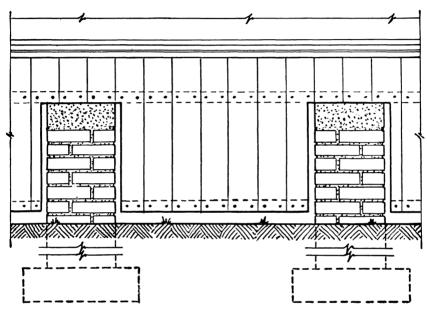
Wooden skirting between piers with a minimum side clearance of 1 inch and ground clearance of 2 inches to prevent attack by termites and decay. Note concrete cap on brick pier to force termites into the open and prevent hidden infestation. Inspections will reveal tubes which can be destroyed, and the soil can be poisoned if necessary.
